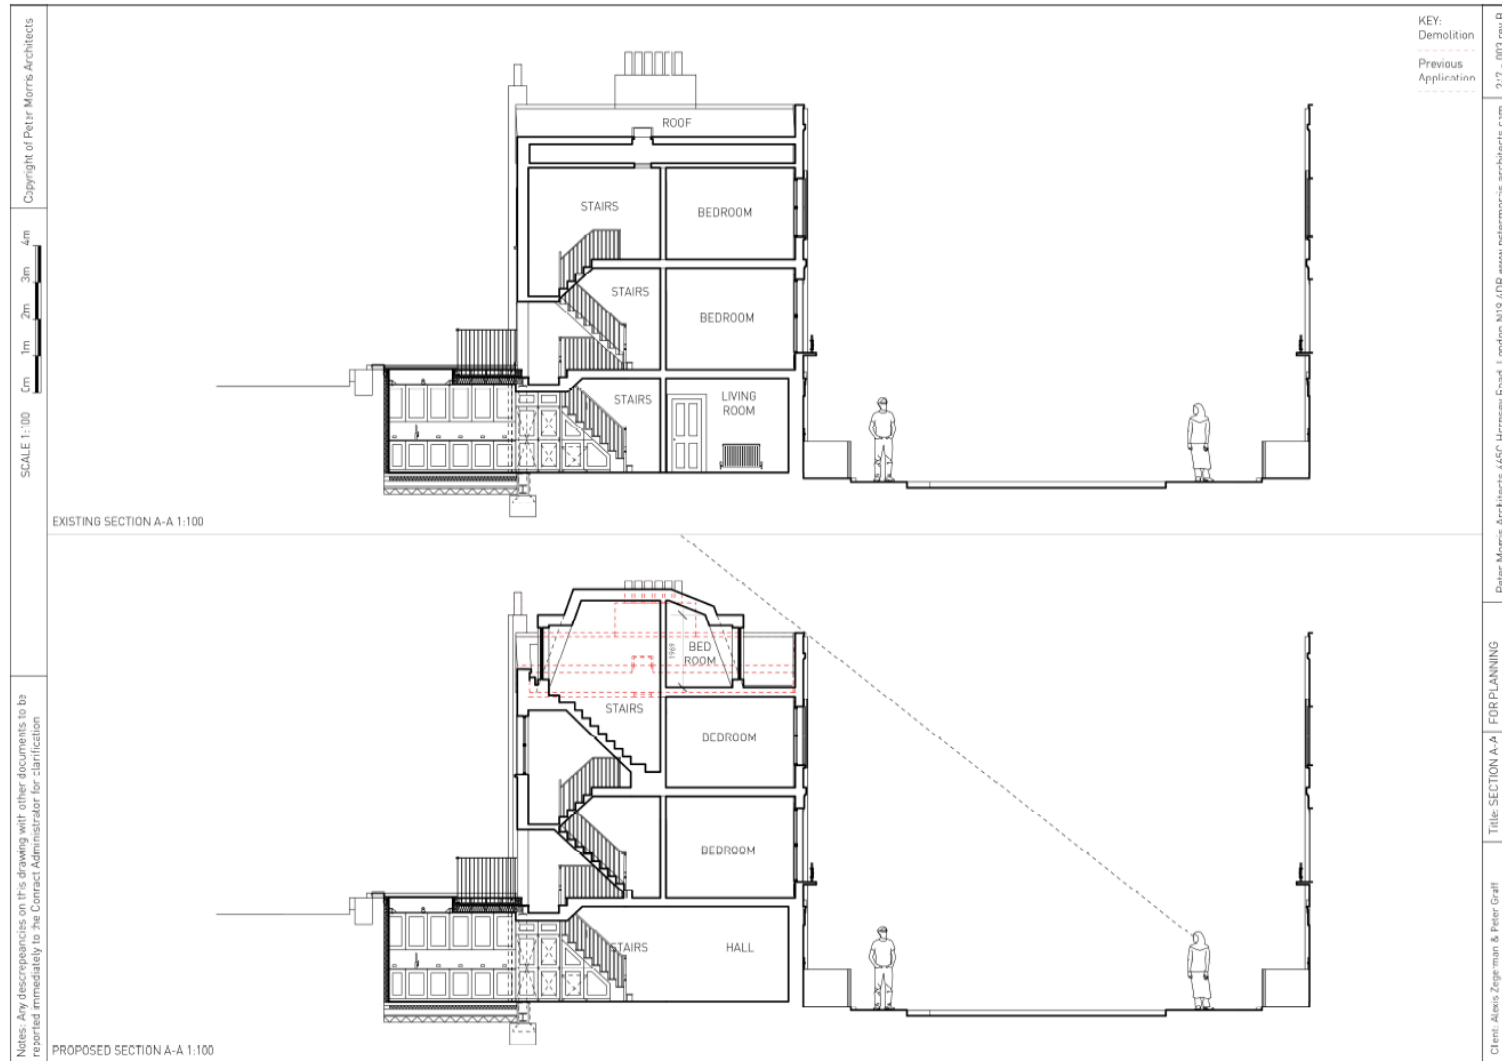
Section Drawing – Existing (top) and Proposed – Note, the proposals have been significantly reduced.
